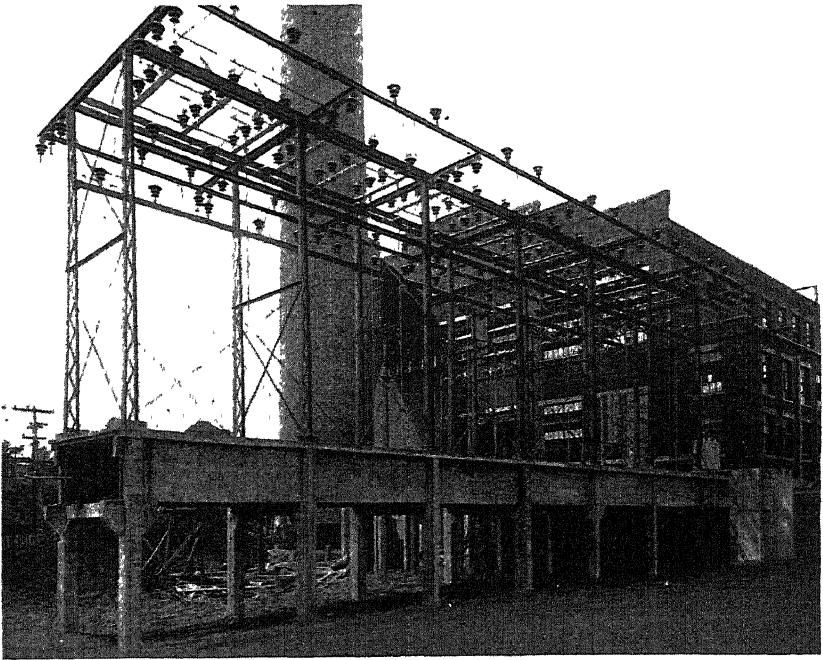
33,000-VOLT STEP-UP OUTDOOR AIR-BREAK SWITCH AND SUBSTATION OUTSIDE OF A POWERHOUSE GENERATING AT 2300 VOLTS STEPPING UP TO 33,000. TWENTY-ONE COAL MINES ARE SUPPLIED FROM LINES LEADING FROM THIS INSTALLATION.
